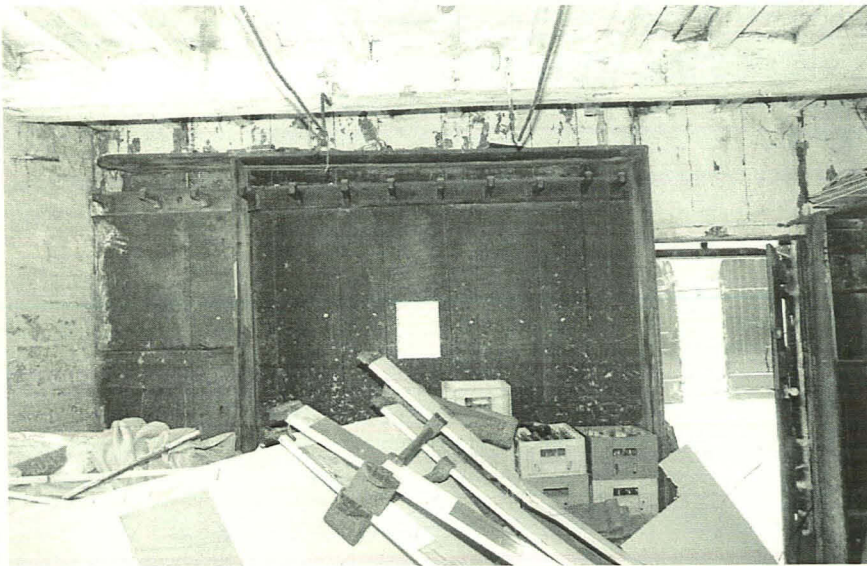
Panelling and Open Cupboard, Ground Floor, East End Store Room, North Wing, looking south
